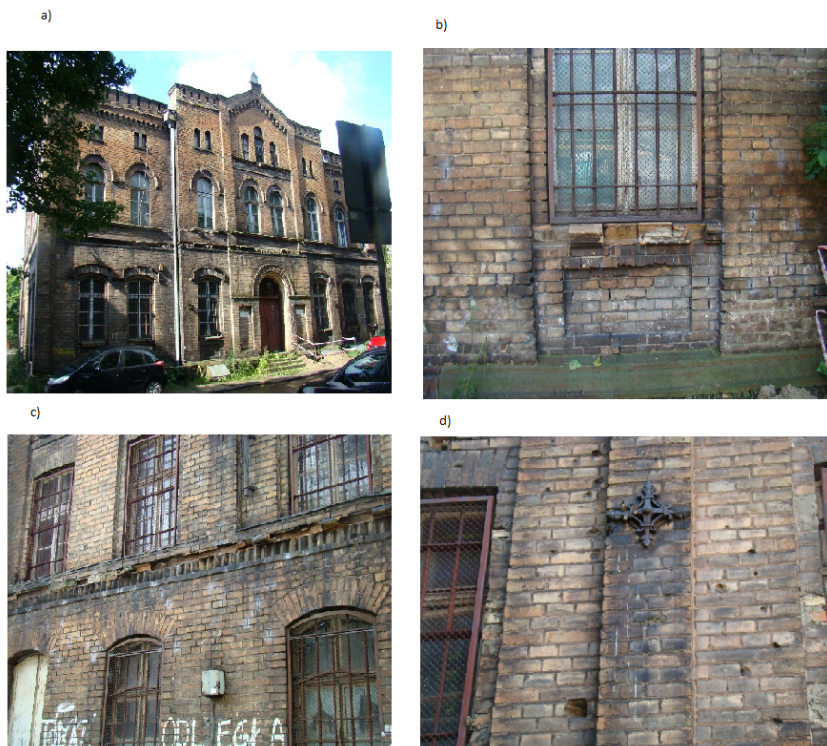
Building planned for modernization - elevations: north-east: a) view, north-west: damage to: b) the sill zone, c) brick basement window lintels (arches), d) front anchoring retaining plate
